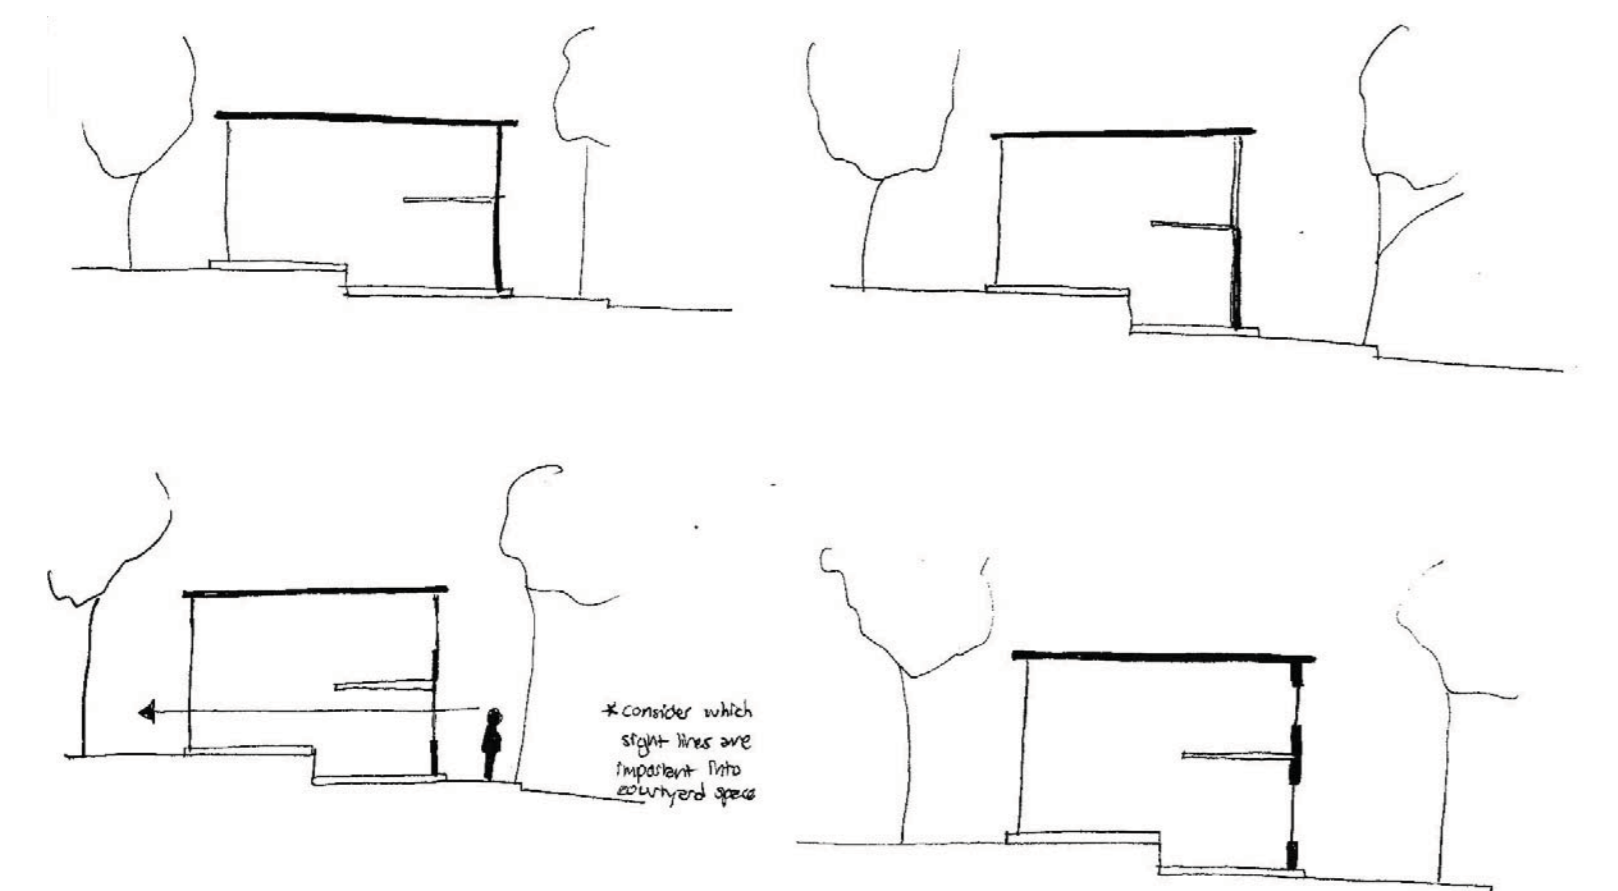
Conceptual sketches of approach to the existing section
